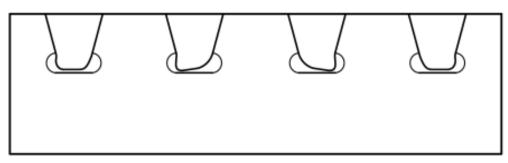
Structural system 6 (Håkansson & Wallerman, 2015)
